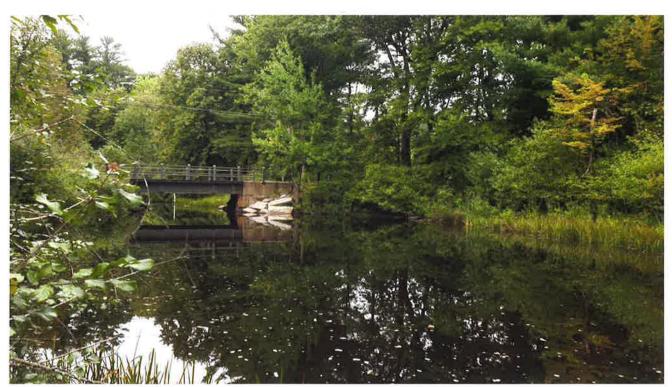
Little River and Garrison Lane Bridge (Facing Northeast)
